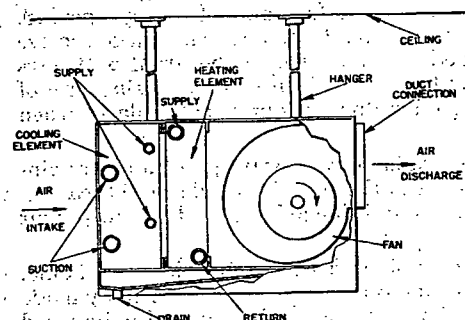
HORIZONTAL REMOTE TYPE UNIT AIR CONDITIONER
